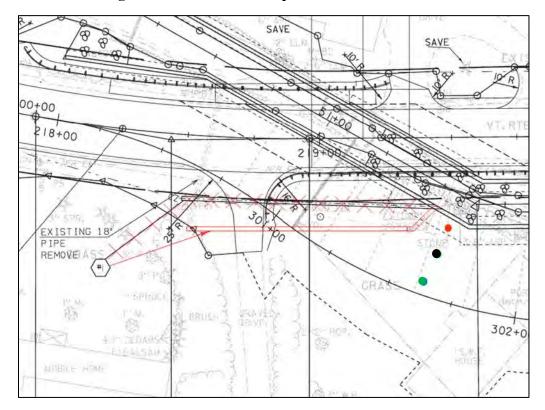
Plan view of the instrumentation at the Williamstown site
